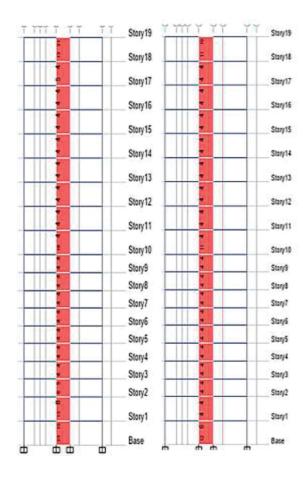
Design of Shear Wall with N.W.C & L.W.C Floors
